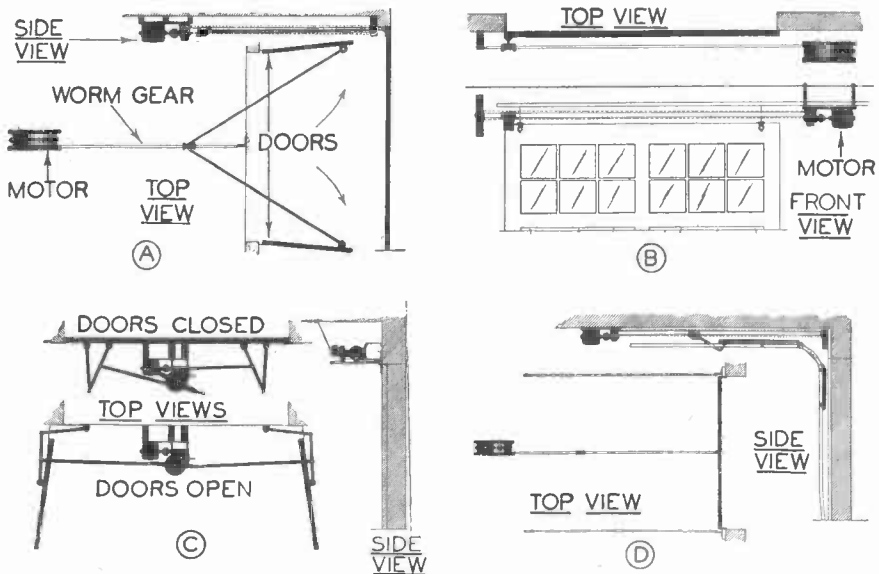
Types of electric door-operating mechanisms. A—top and side views of motor-driven worm gear mechanism for opening outward-swinging double doors; B—motor-driven endless cable type opener for opening single-section sliding door; C—motor-driven crank and link mechanism for opening inward-swinging double doors; D—motor-driven endless cable type opener for overhead doors.
